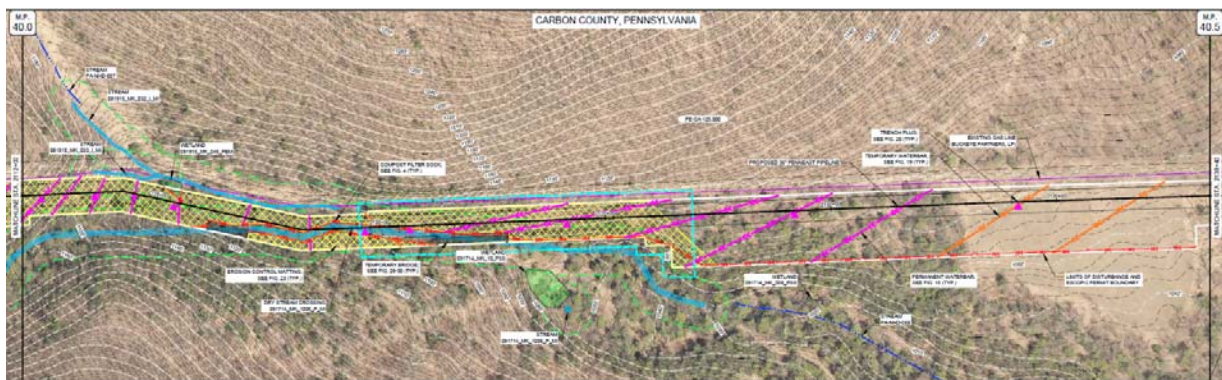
Erosion and Sediment Control Plan Alignment Sheet 81 MP 40.0 to MP 40.5
